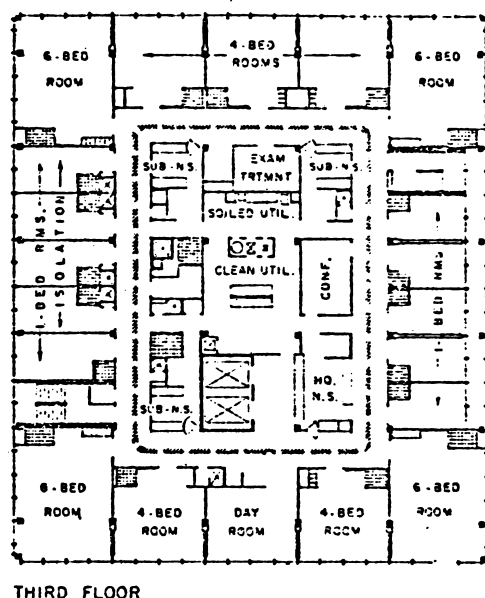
Ward floor layout, Whitesburg Hospital, Kentucky
